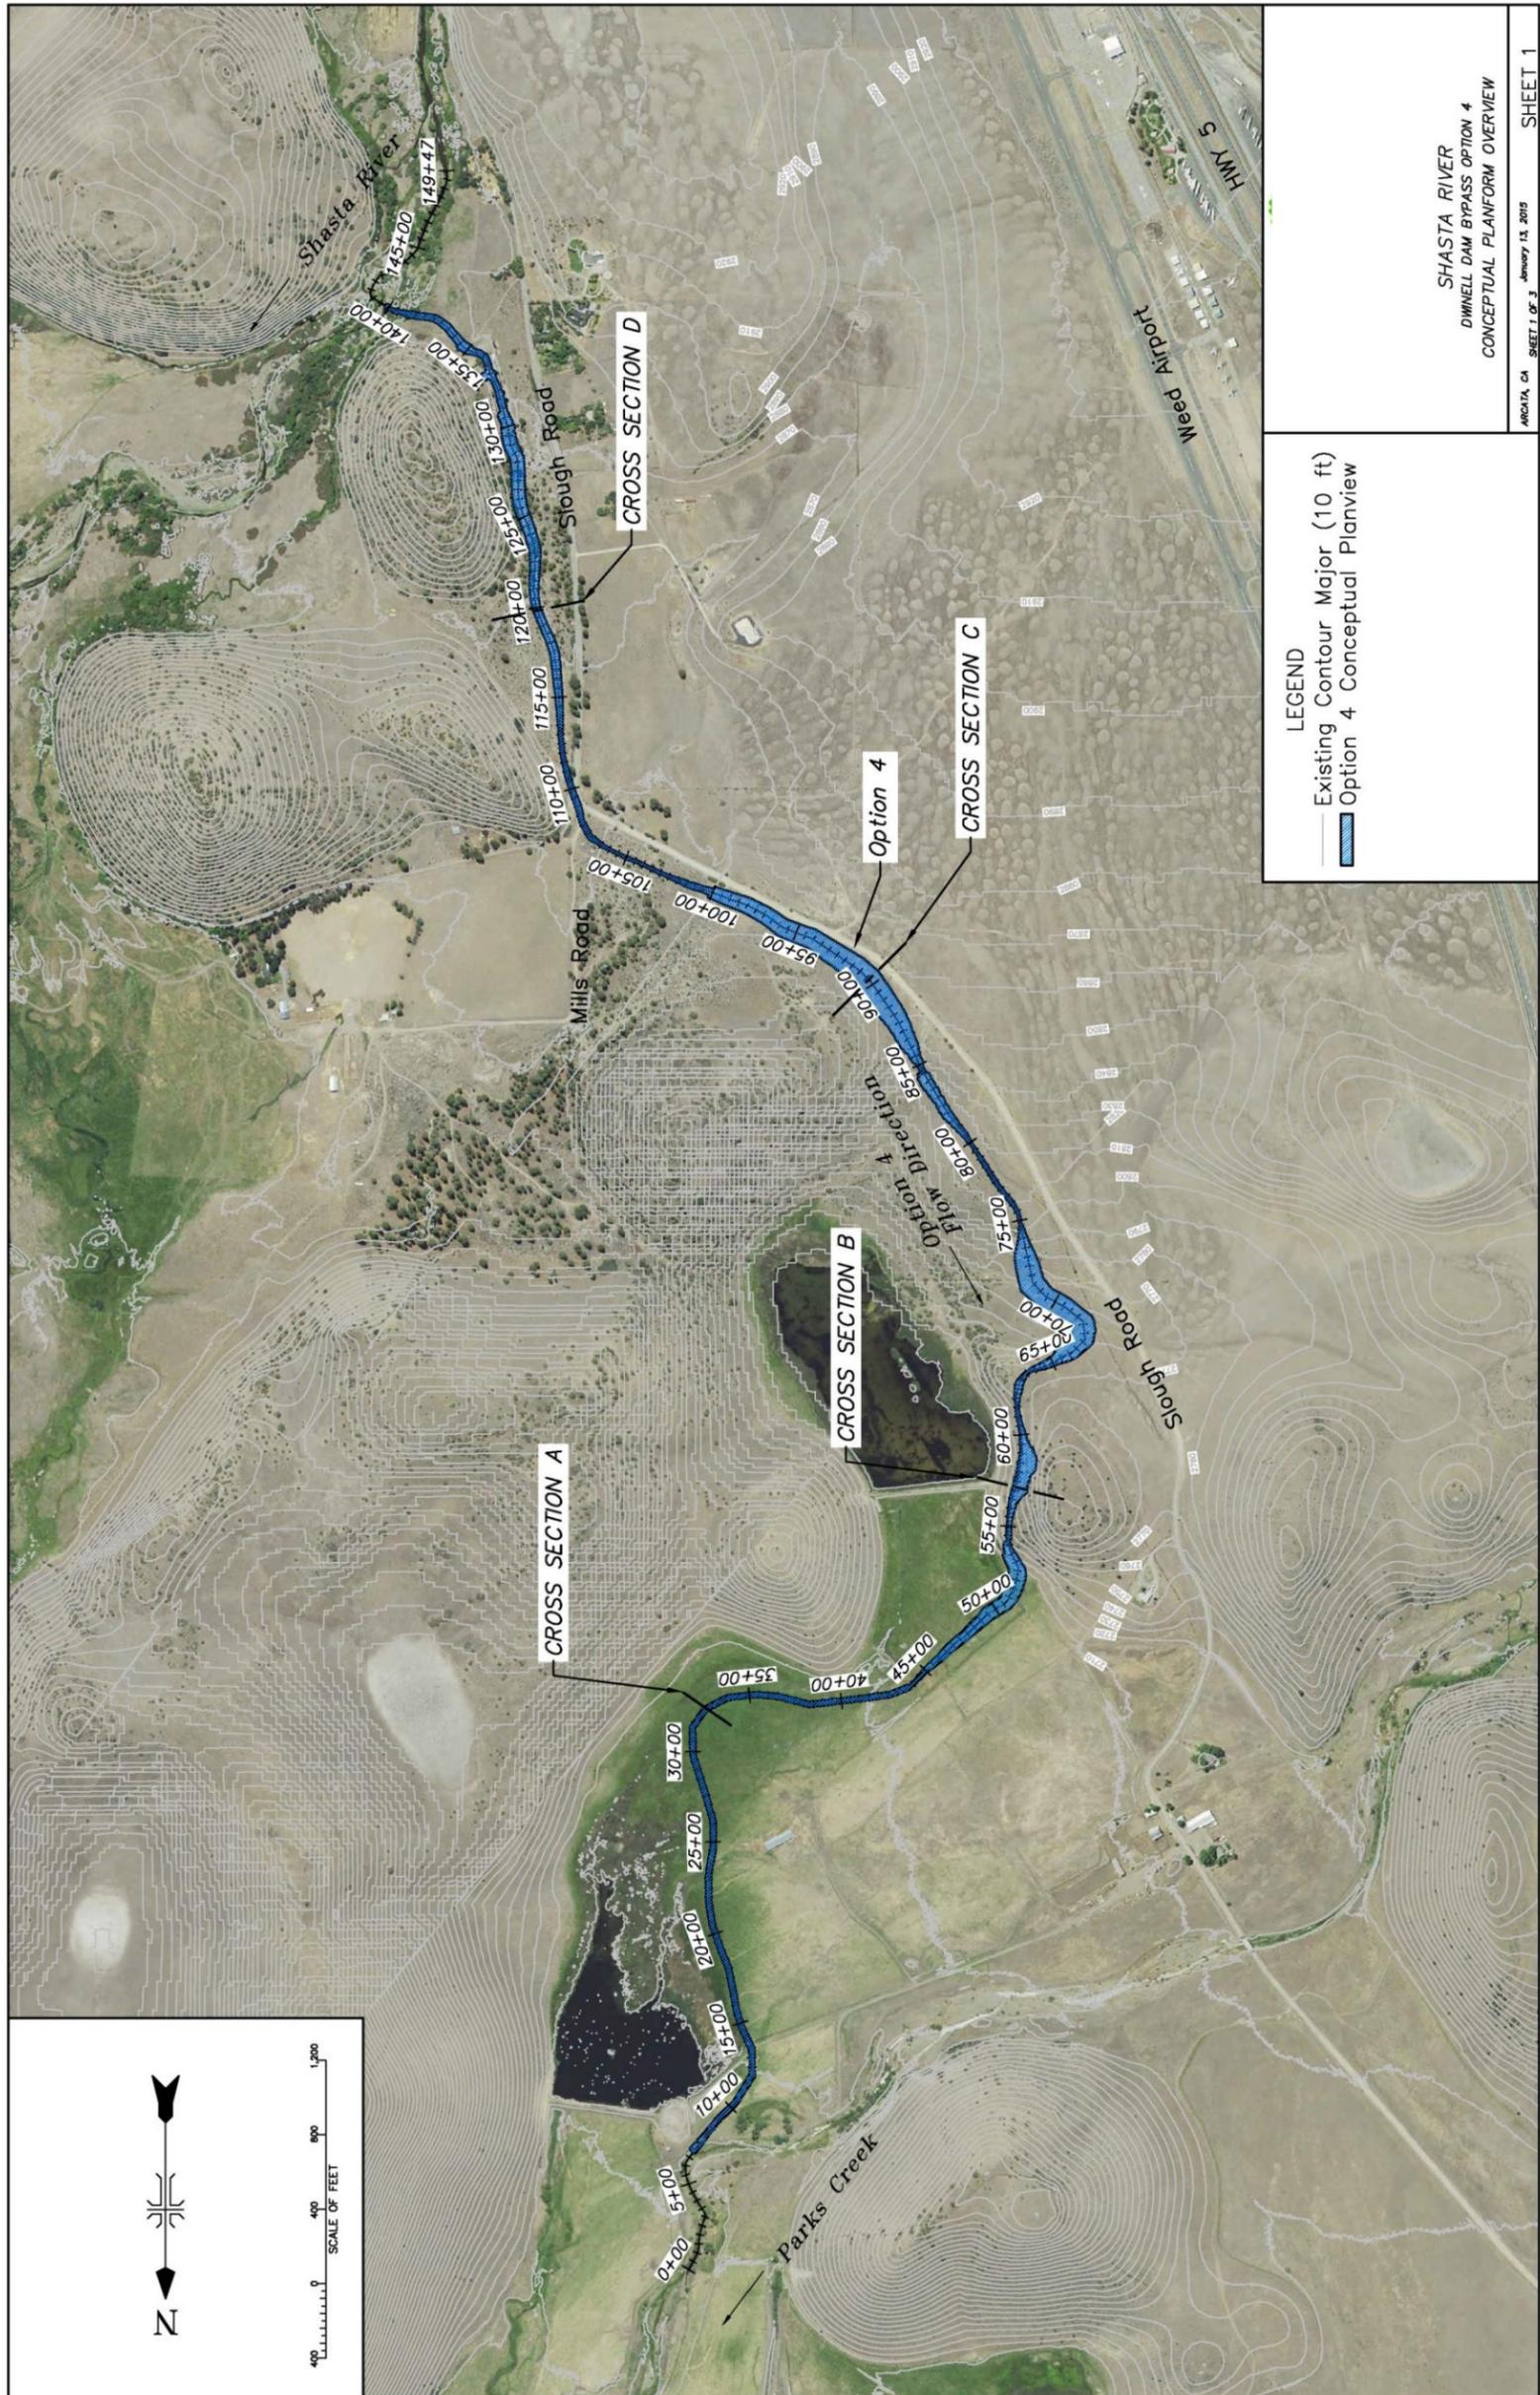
Planform view of bypass Route D (Option 4), showing channel widths and the locations of cross sections from Figure 10.
